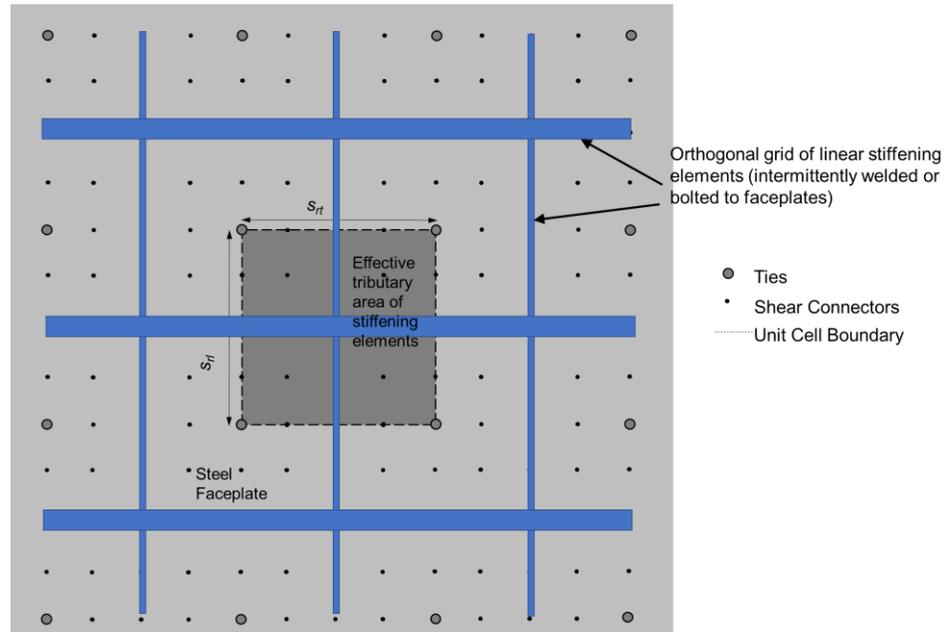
Elevation view of a typical SC wall with linear reinforcing elements (faceplate not shown for clarity)
